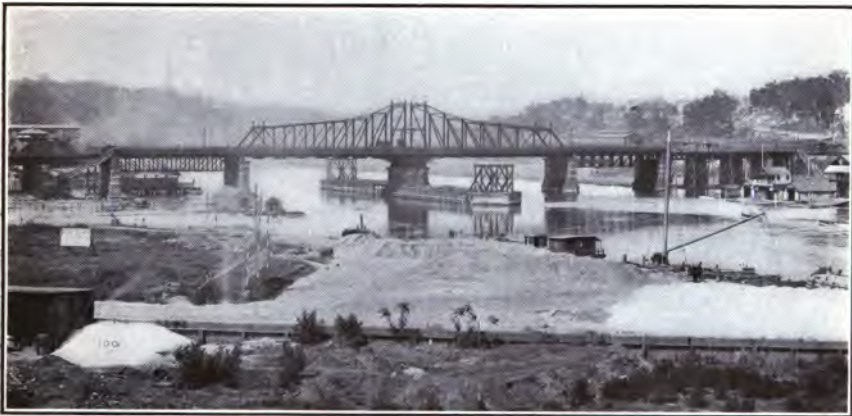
NEW YORK AND PUTNAM BRIDGE.
